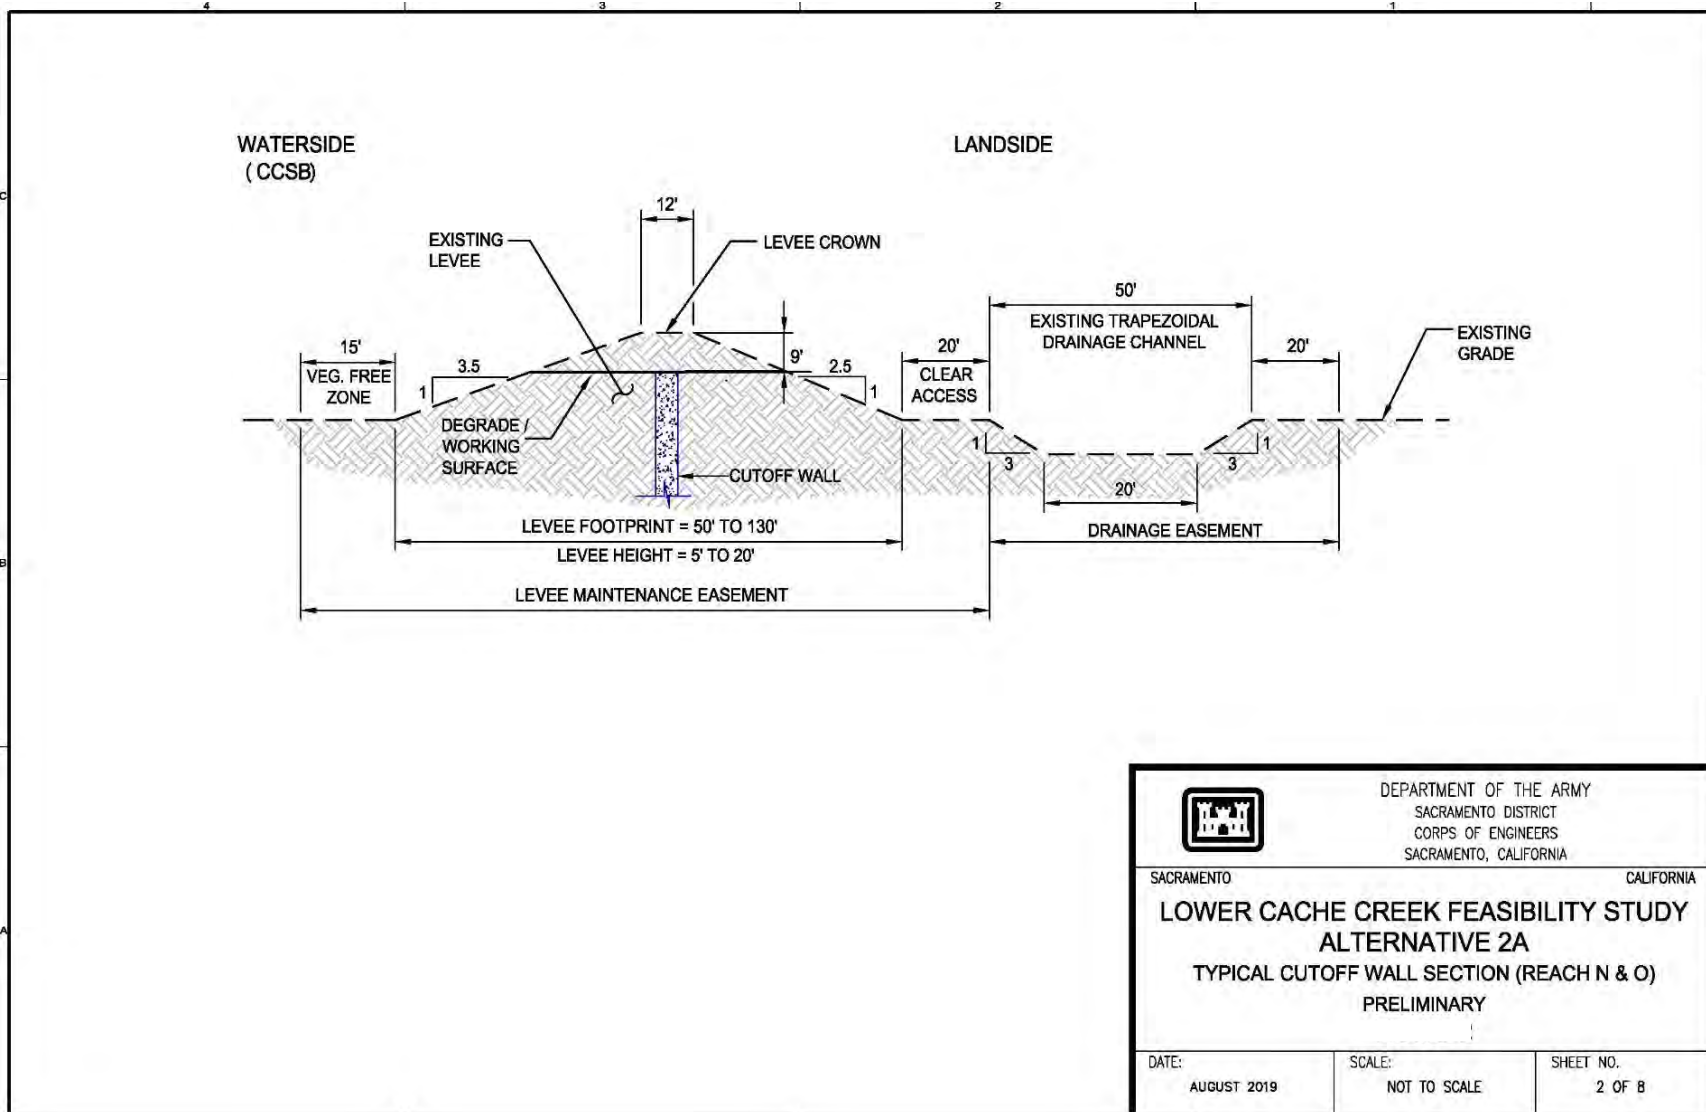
Typical Cutoff Wall Section (Reaches N & O)
